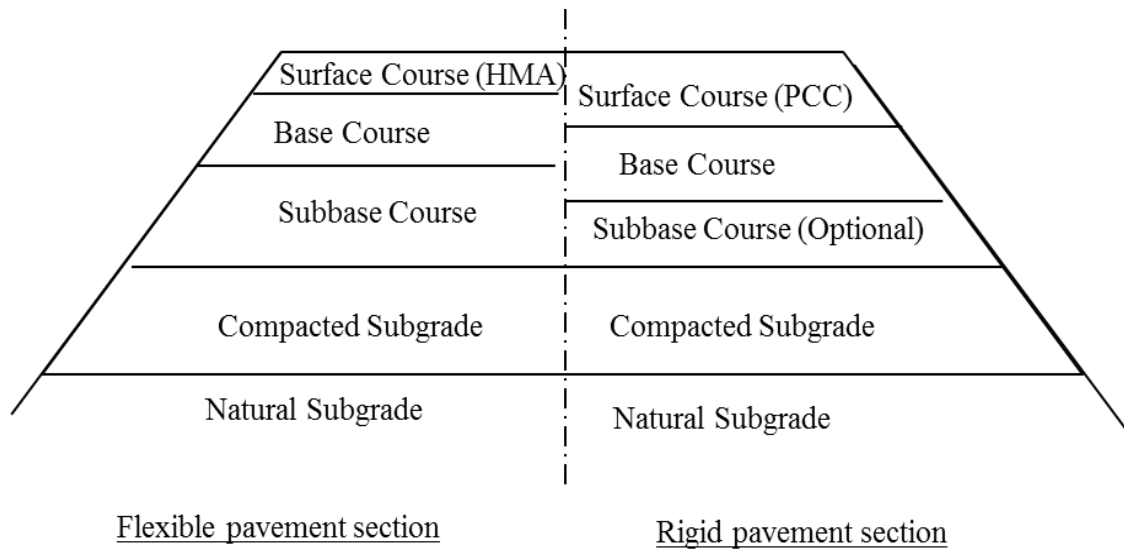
Typical sections of a flexible pavement and a rigid pavement.
